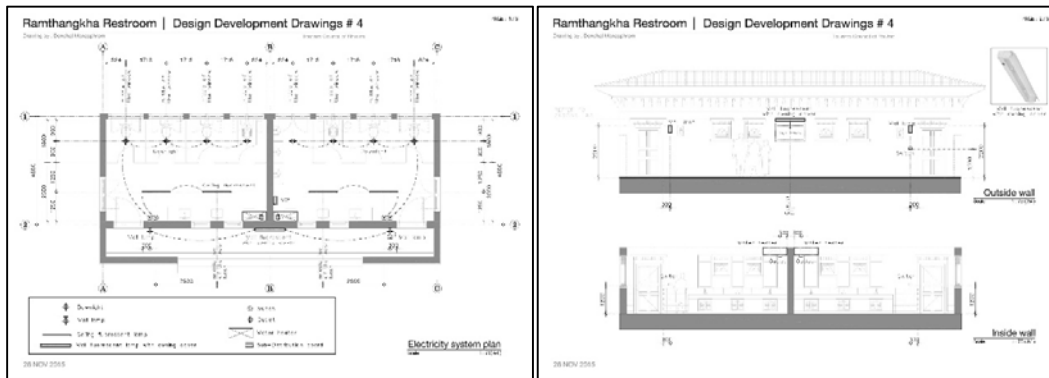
,18. Electrical system renovation drawings of Ramthangkha (Taksang base) restrooms
